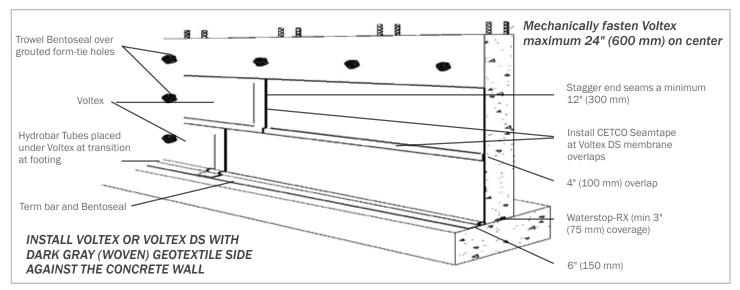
Voltex installed on cast-in-place backfilled wall, overlap edges 4" (100 mm) and stagger vertical end laps.
